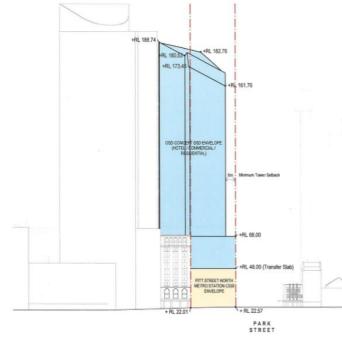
Pitt Street North Concept SSD DA - Envelope - South Elevation (Source: SSD 8875 Concept Stamped Plans)
